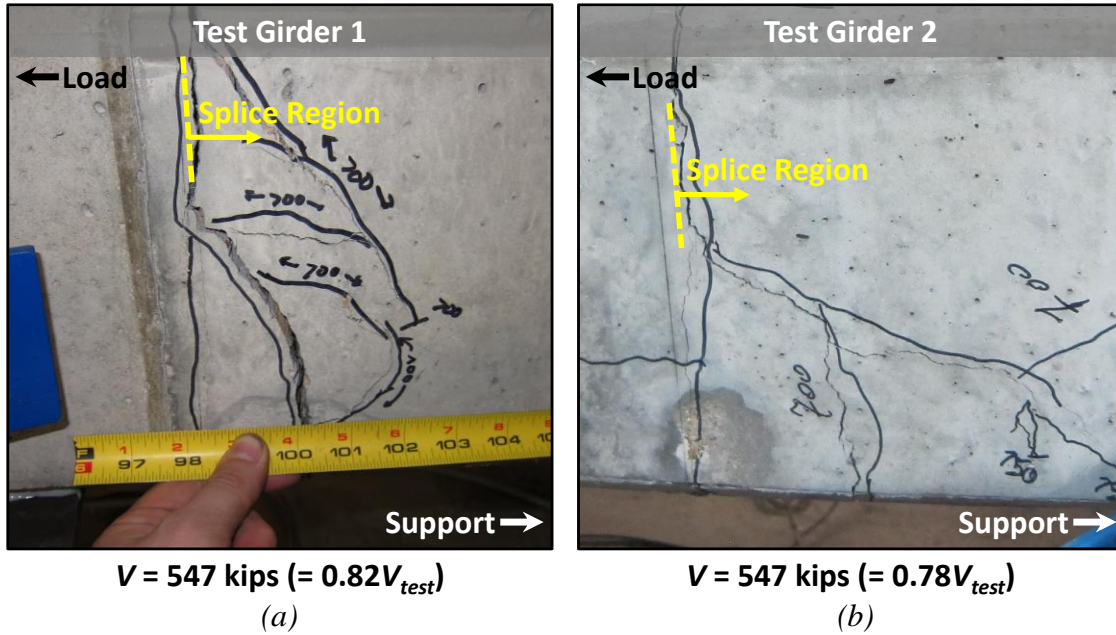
Flexural cracking near the splice region interface – (a) Test Girder 1; (b) Test Girder 2
